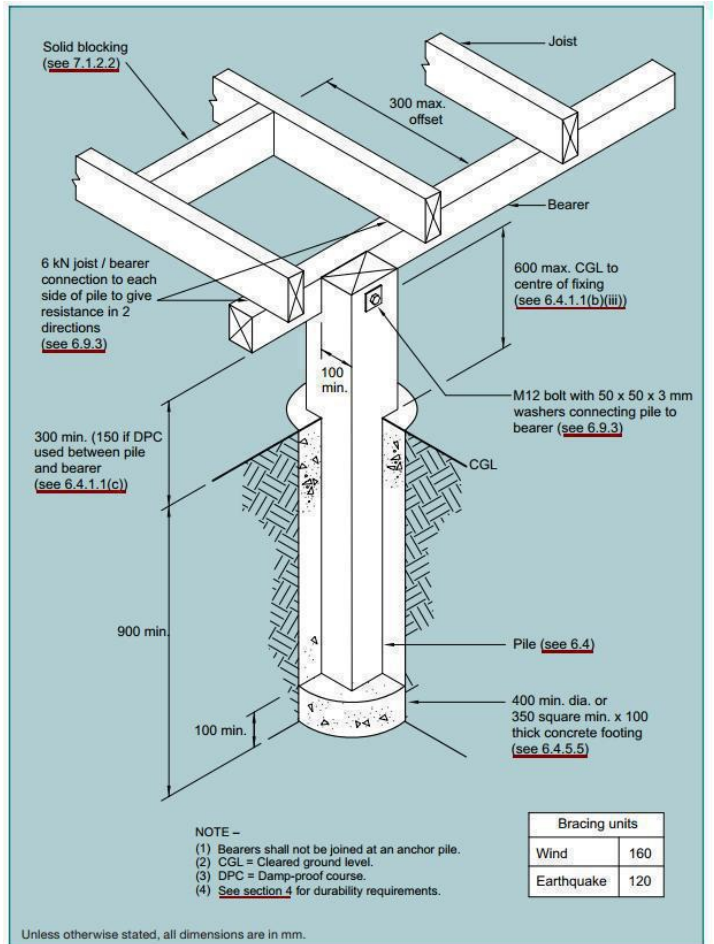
Anchor pile directly connected to bearer only (see 6.9)
